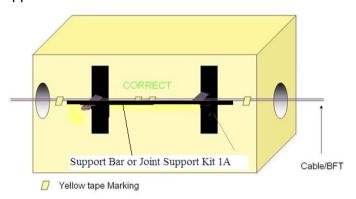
Brackets & Bearers are useable, cable/BFT/Sub-duct (less than 25mm) supported on installed Support Bar or Joint Support Kit 1A.
